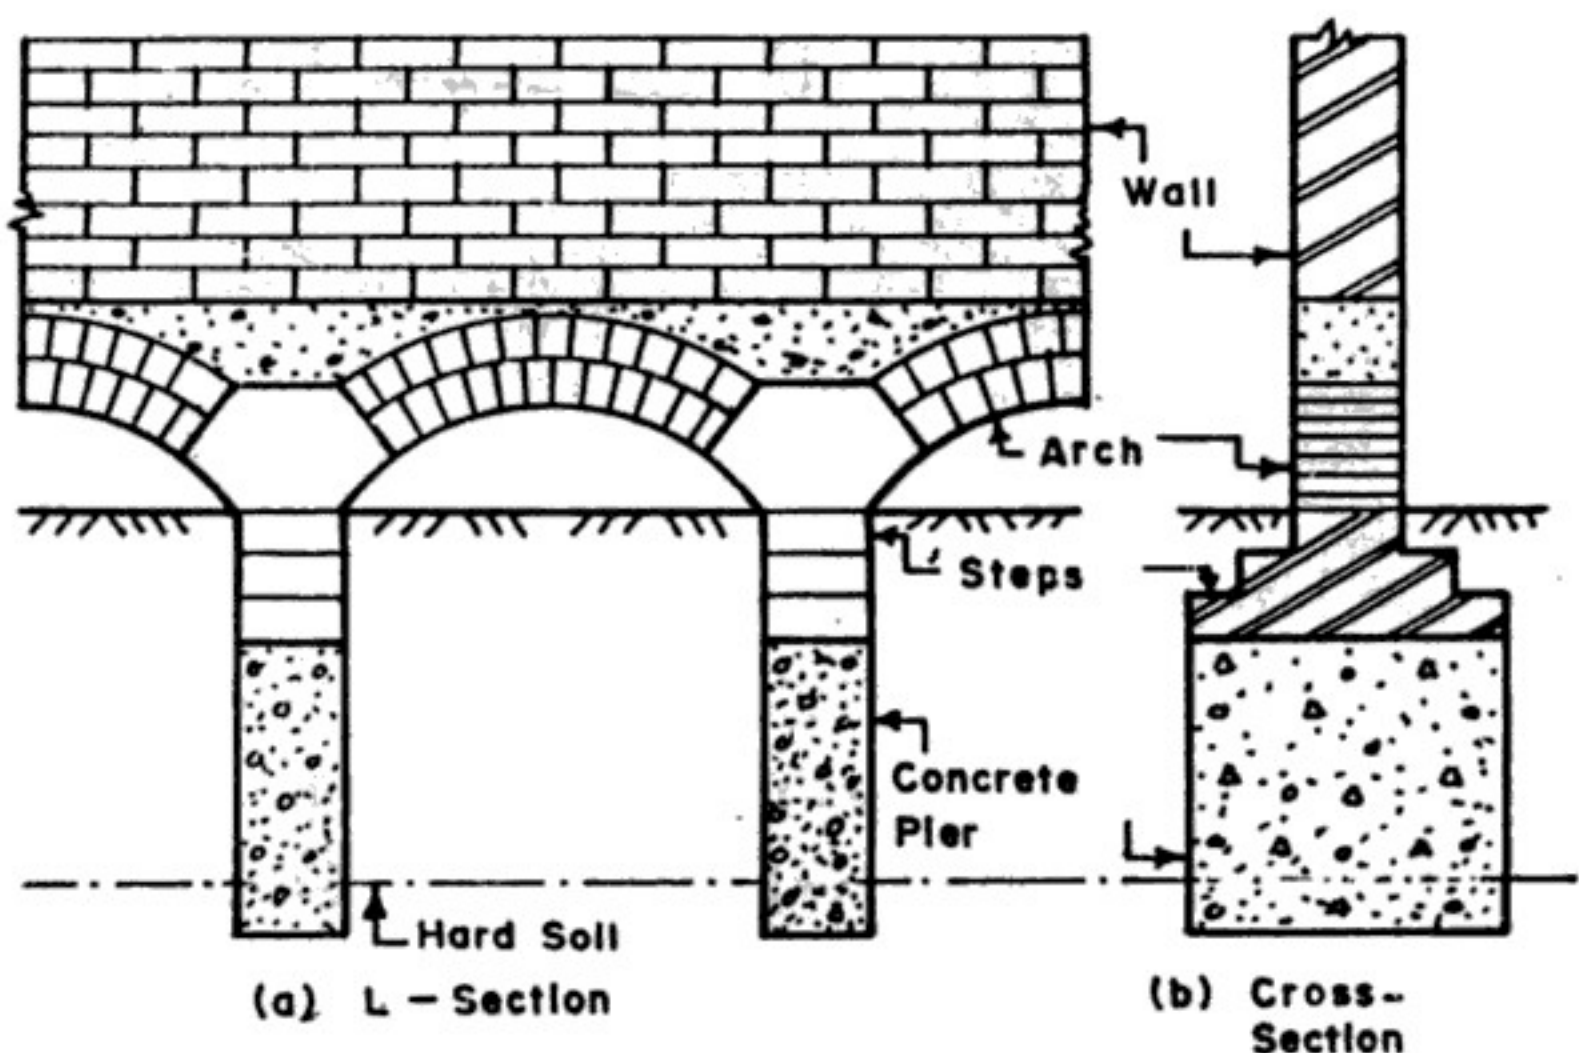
PIER FOUNDATIONS WITH ARCH.
